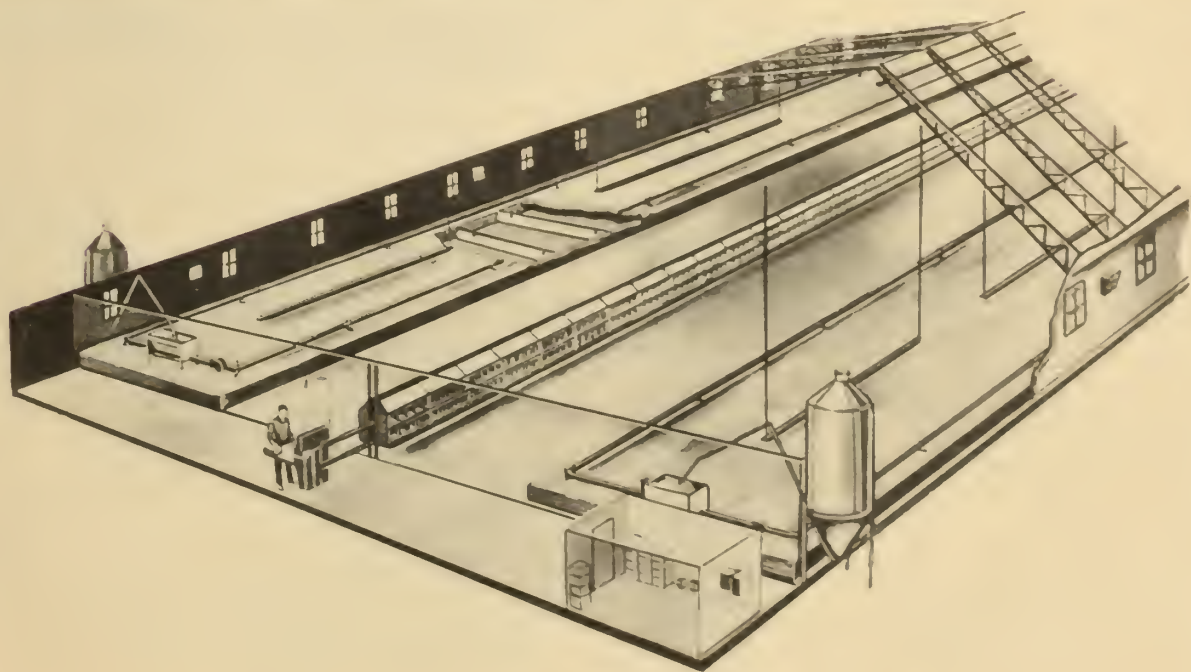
Automated laying house with mechanical feeders and waterers above a raised platform and with partial wood-slat floors.
